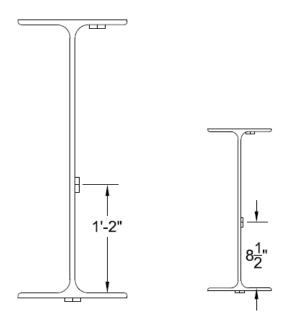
Gage location on Chester cross section of floor beams and stringers respectively
